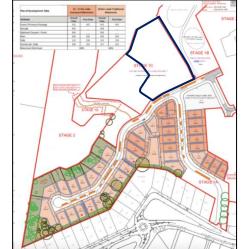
Approved Subdivison Plan (Source: Place Design) – Site outlined in blue
